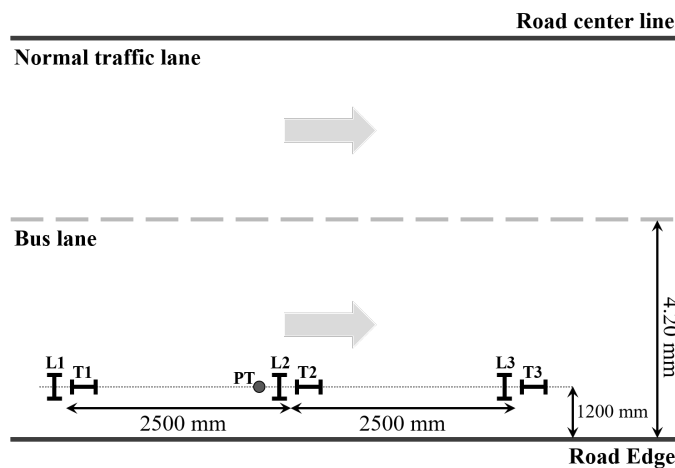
Top view layout of embedded sensor arrangement in a single test section at Neuchâtel, where L: longitudinal ASG, T: transverse ASG, and PT: PT100.
